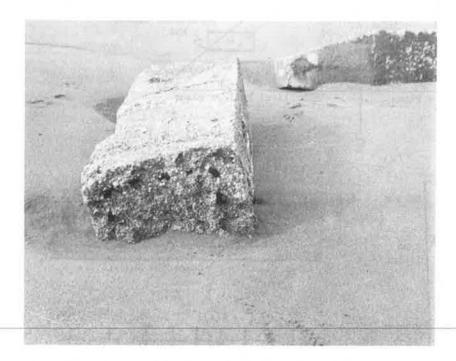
Bamboo Reinforced Concrete Wall Built in 1940 Found in Vicinity of Taichung Harbor, Taiwan, in 1976. Shows Bamboo Culm Inside the Concrete Wall Still in Excellent Condition. (Courtesy of H. C. Chiu, Taichung Harbor Construction Bureau)
